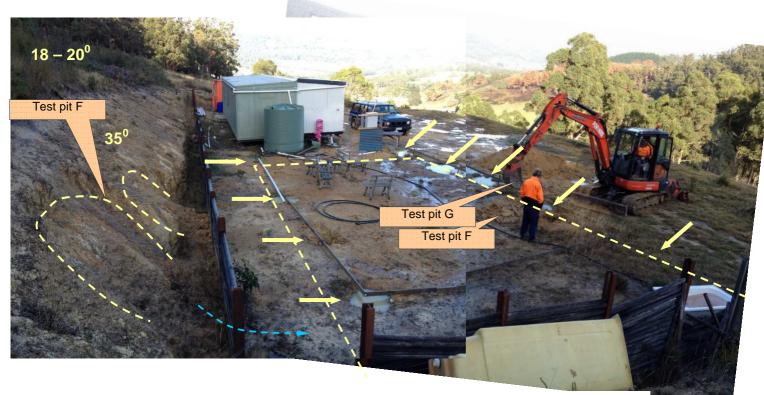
(above). View south southwest showing the proposed house site (yellow dashed line; approx. only), previously-dug auger holes for piers (arrowed), test pits F and G, the steel-posted and undrained timber retaining wall (blue dashed line shows water flow), the 350 batter slope behind, and two very small rotational landslides on the batter face.
